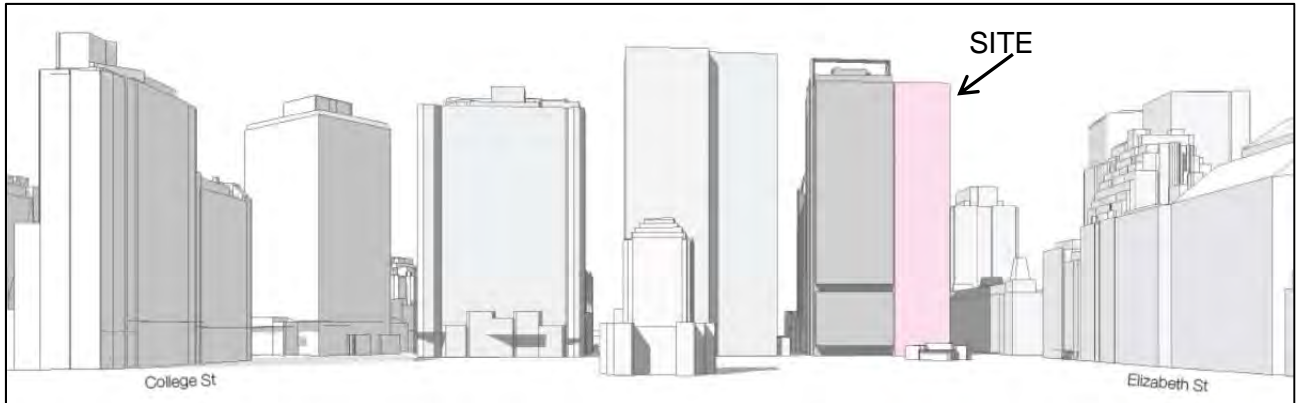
Stage 1 DA building envelope massing (i.e. 110 metres) as viewed from Hyde Park
